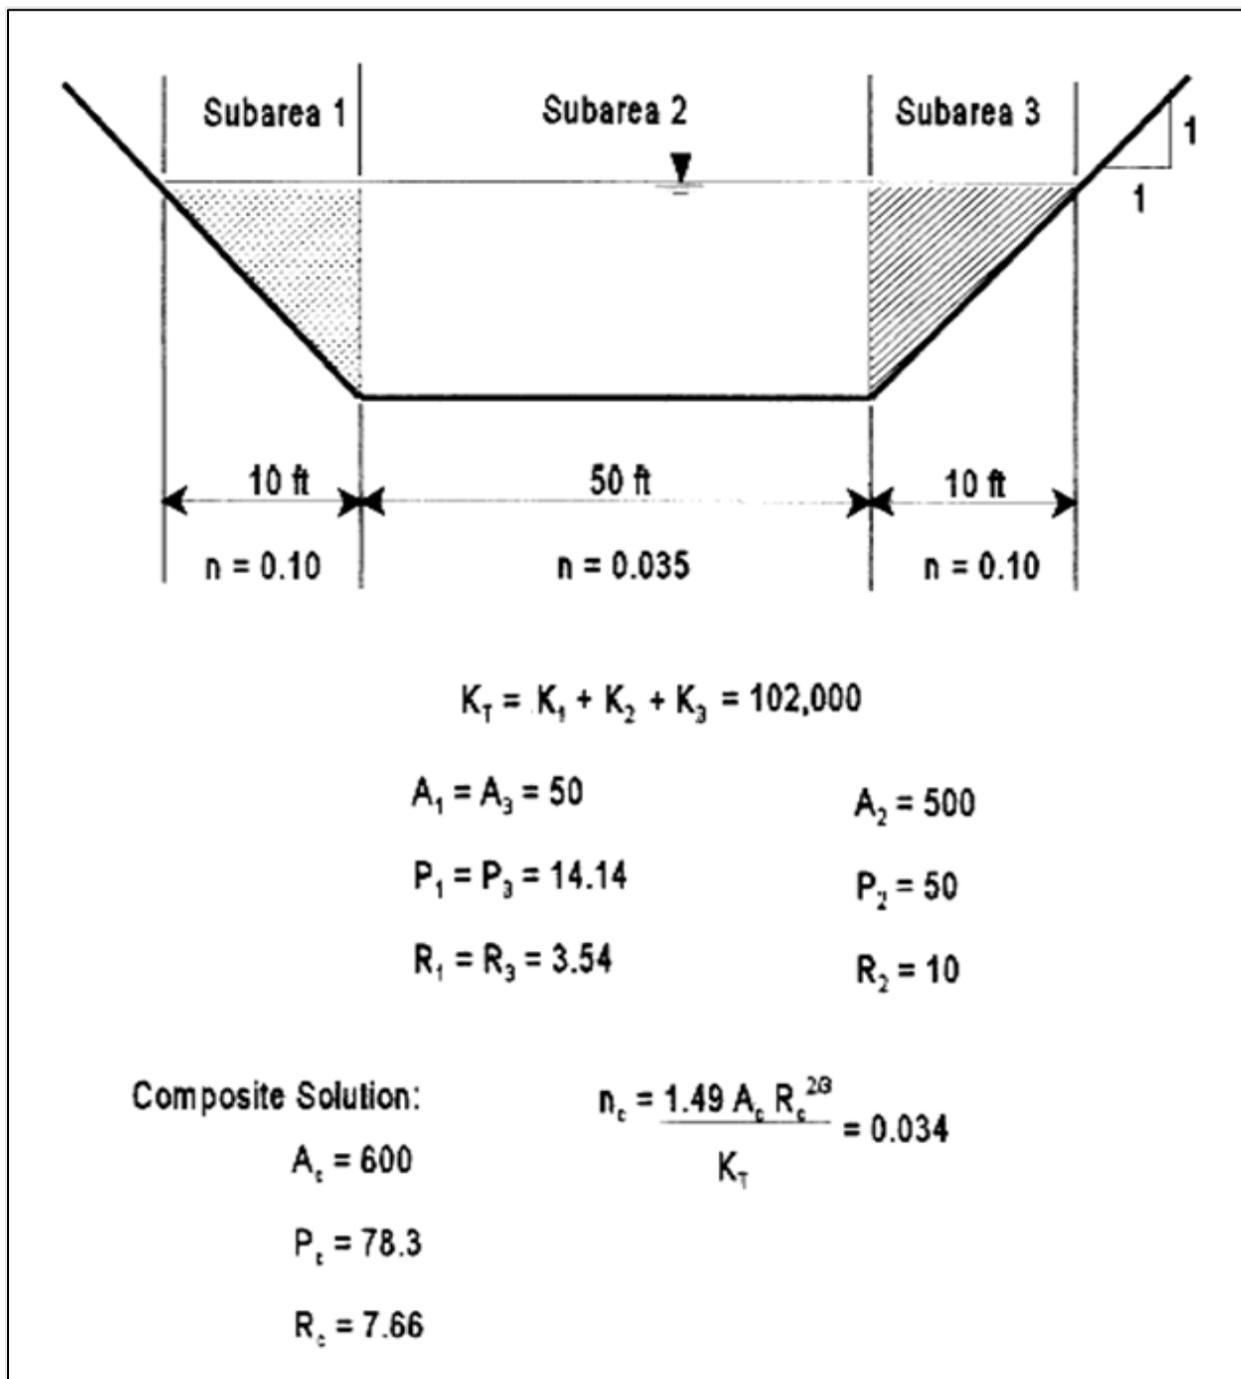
Effects of Subdivision on a Trapezoidal Section
